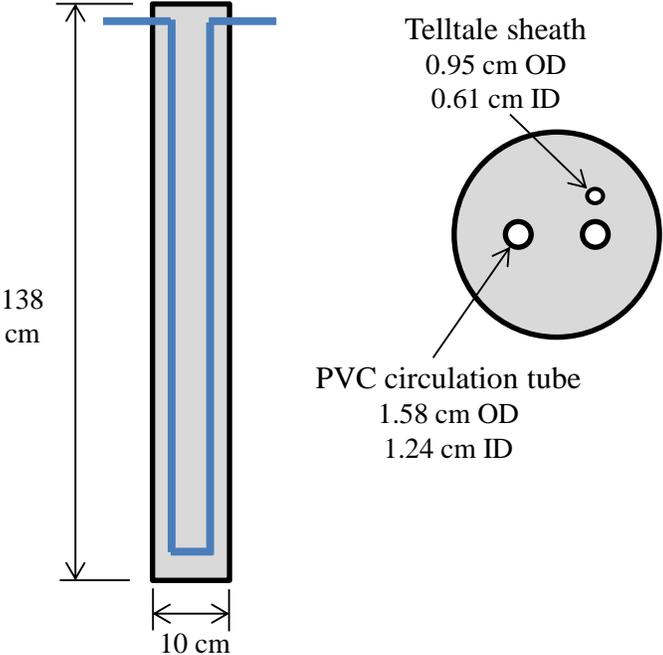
Vertical and horizontal cross-sections of the test pile
